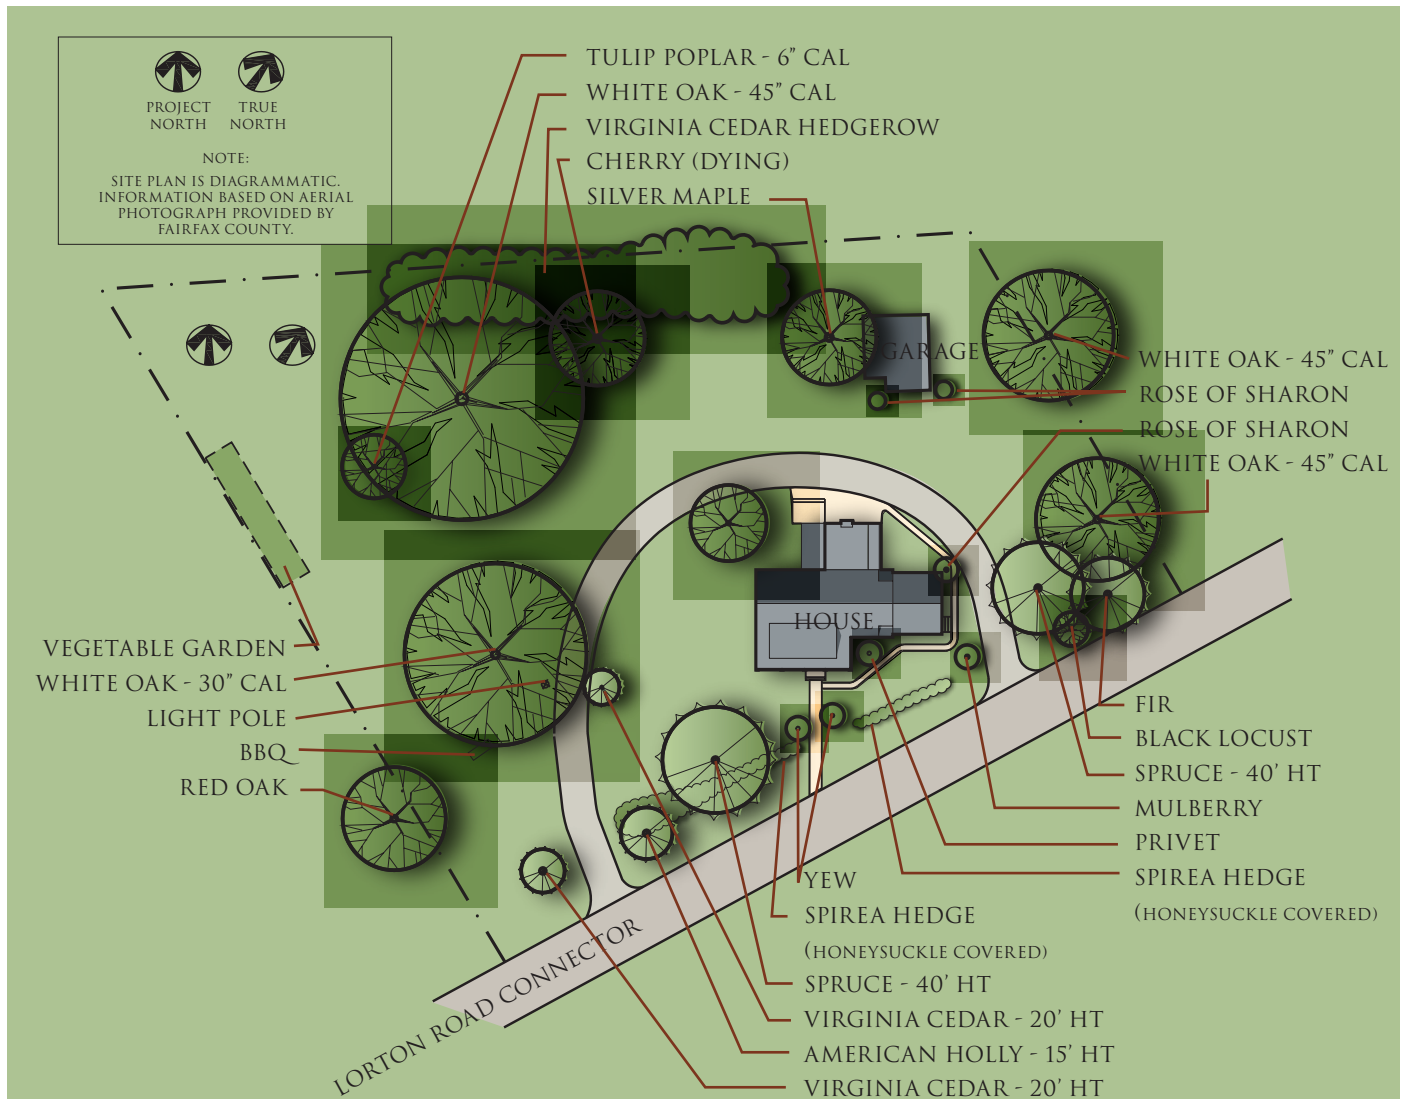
The Existing Conditions Site Plan for the Physician's Residence shows a number of mature site trees, other plantings, a loop driveway, walkways, and paved patio spaces.
